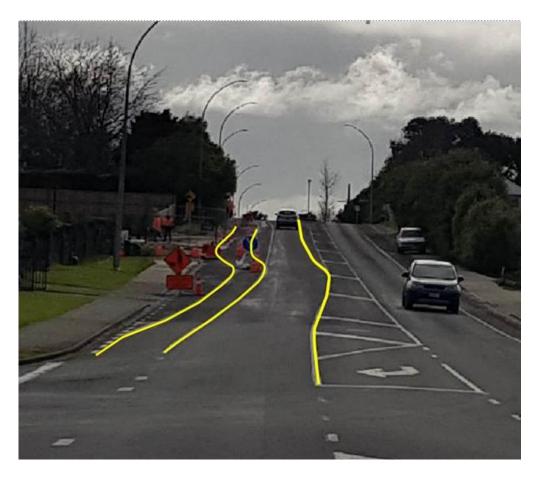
Illustration of cycle lane markings looking north up Horsham Downs Road from Moonlight Drive if on-street parking were retained.
